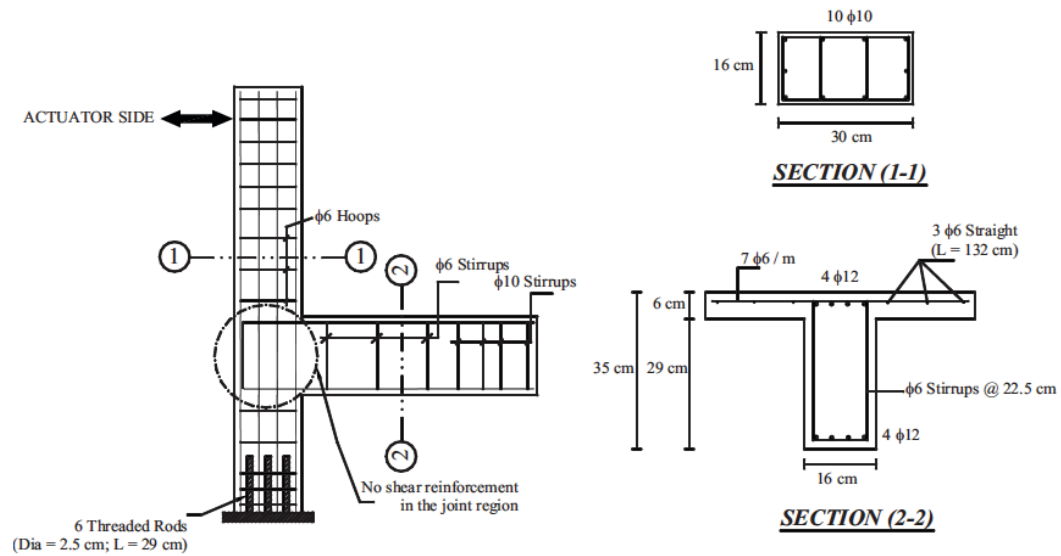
Reinforcement details of Alsayed et al. (2010) test specimens
